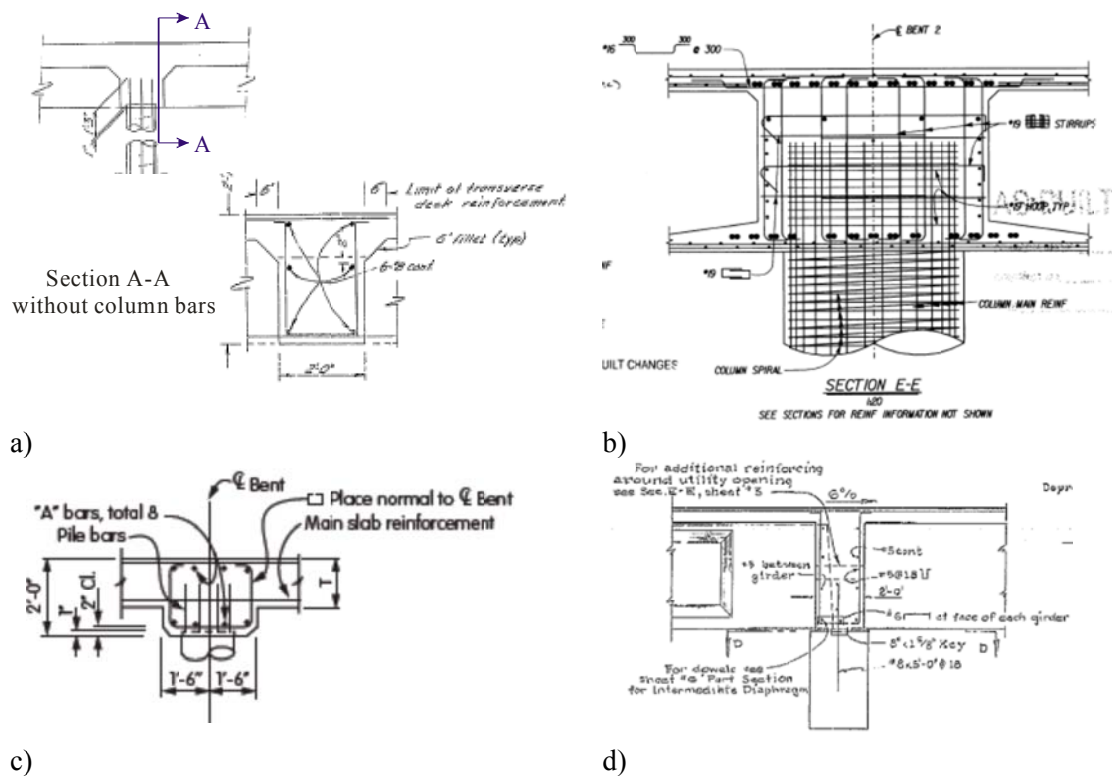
Typical joint details from a) Pre 1971 design era in MSCC-SBG, b) Post 1990 MSC-SBG, c) MSCSL, and d) MSCG-I girder bridge class
